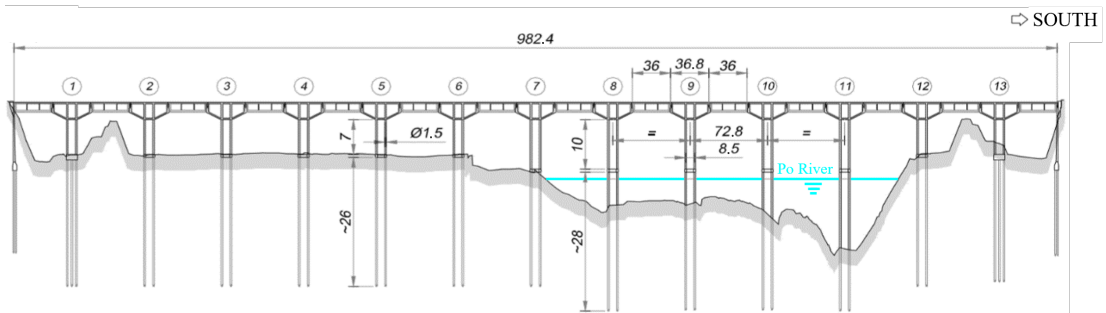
Elevation of the A22 Po River Bridge. Dimensions in metres.
